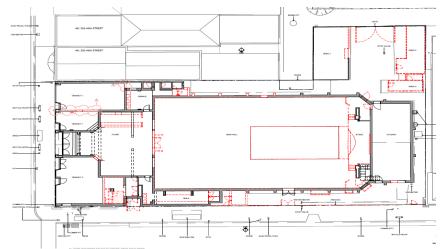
Existing ground floor of the Northcote Theatre, taken from the Planning Report prepared by Tract. Land surrounding No. 212 - 220 High Street, Northcote
